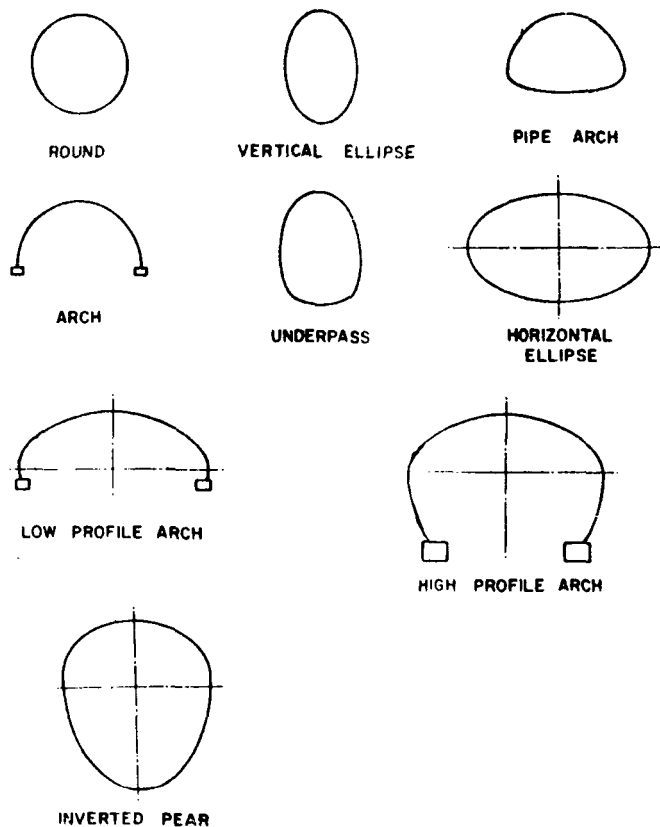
A Standard Terminology of Structural Plate Shapes Including Long-Span Structures
